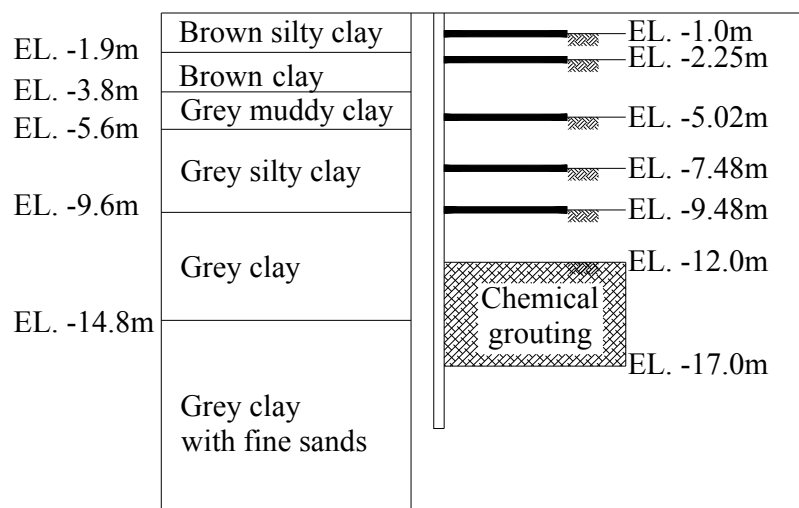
Stratigraphy and excavation support system of the Caobao subway excavation (Modified from Shao and Macari 2008)
